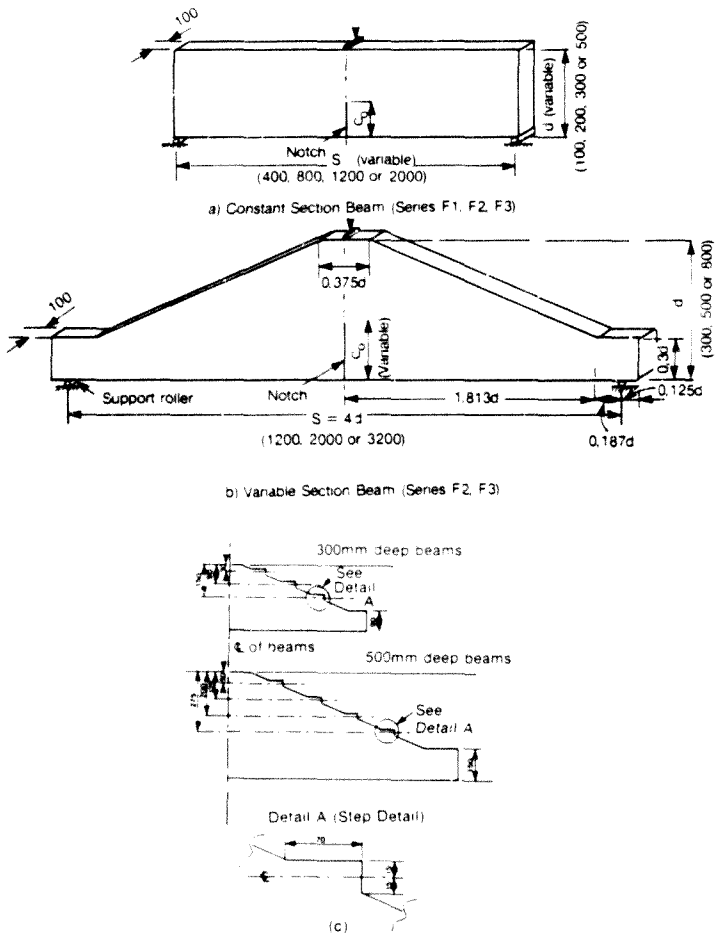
Details of constant and variable section notched beams (a) Constant section beams (b) Variable section beams (c) Details of "steps" on sloping faces of variable section beams
